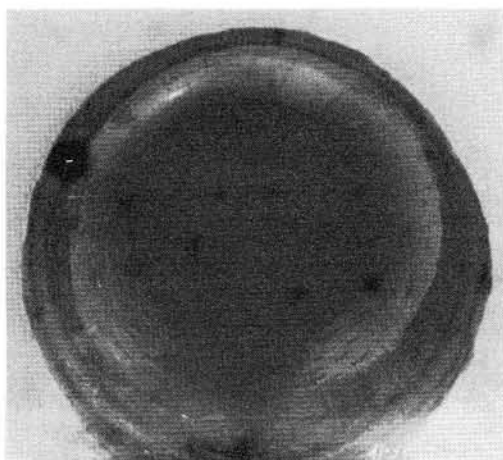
Texture of Concrete Culvert Pipe and Joint, Stillwater, Oklahoma.
